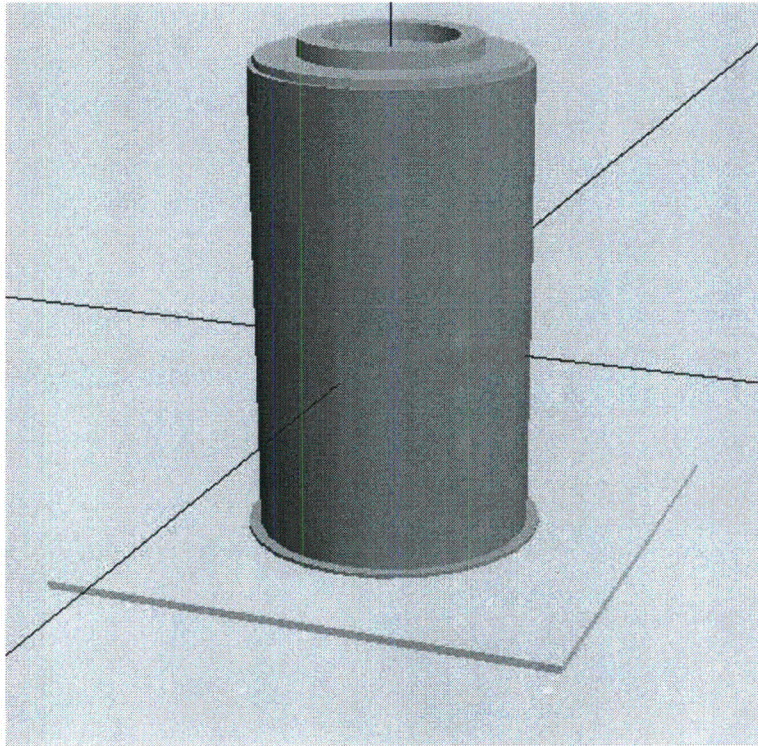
VIEW OF ASSEMBLED HI-STORM ON PAD-MPC
